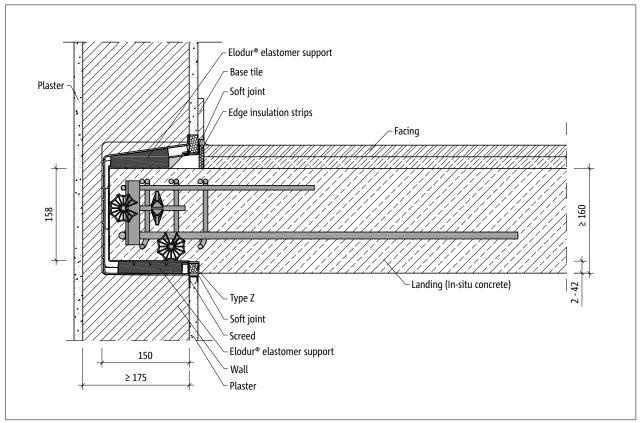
Schöck Tronsole® type Z-V+V-T: Installation cross-section in-situ concrete landing
